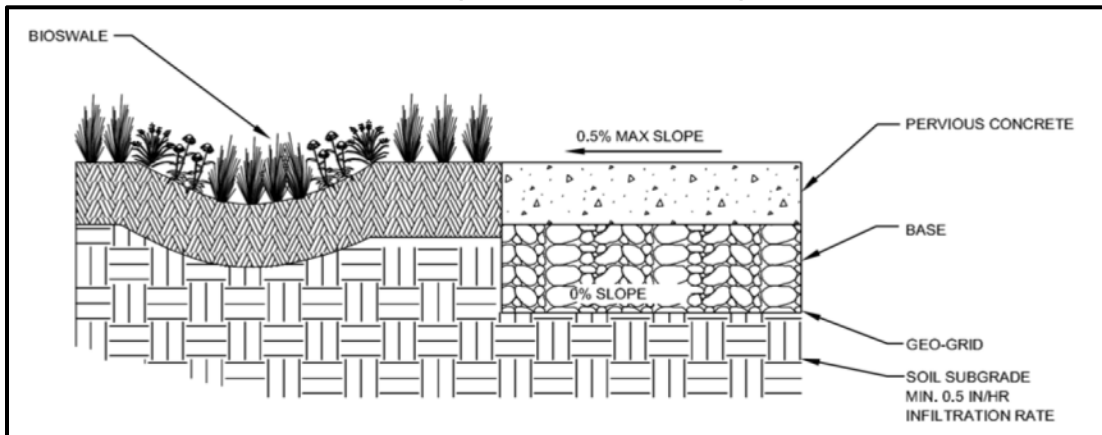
Pervious Concrete With Underdrain System and Bioretention Area Outlet (from LJCMSD, 2009).
